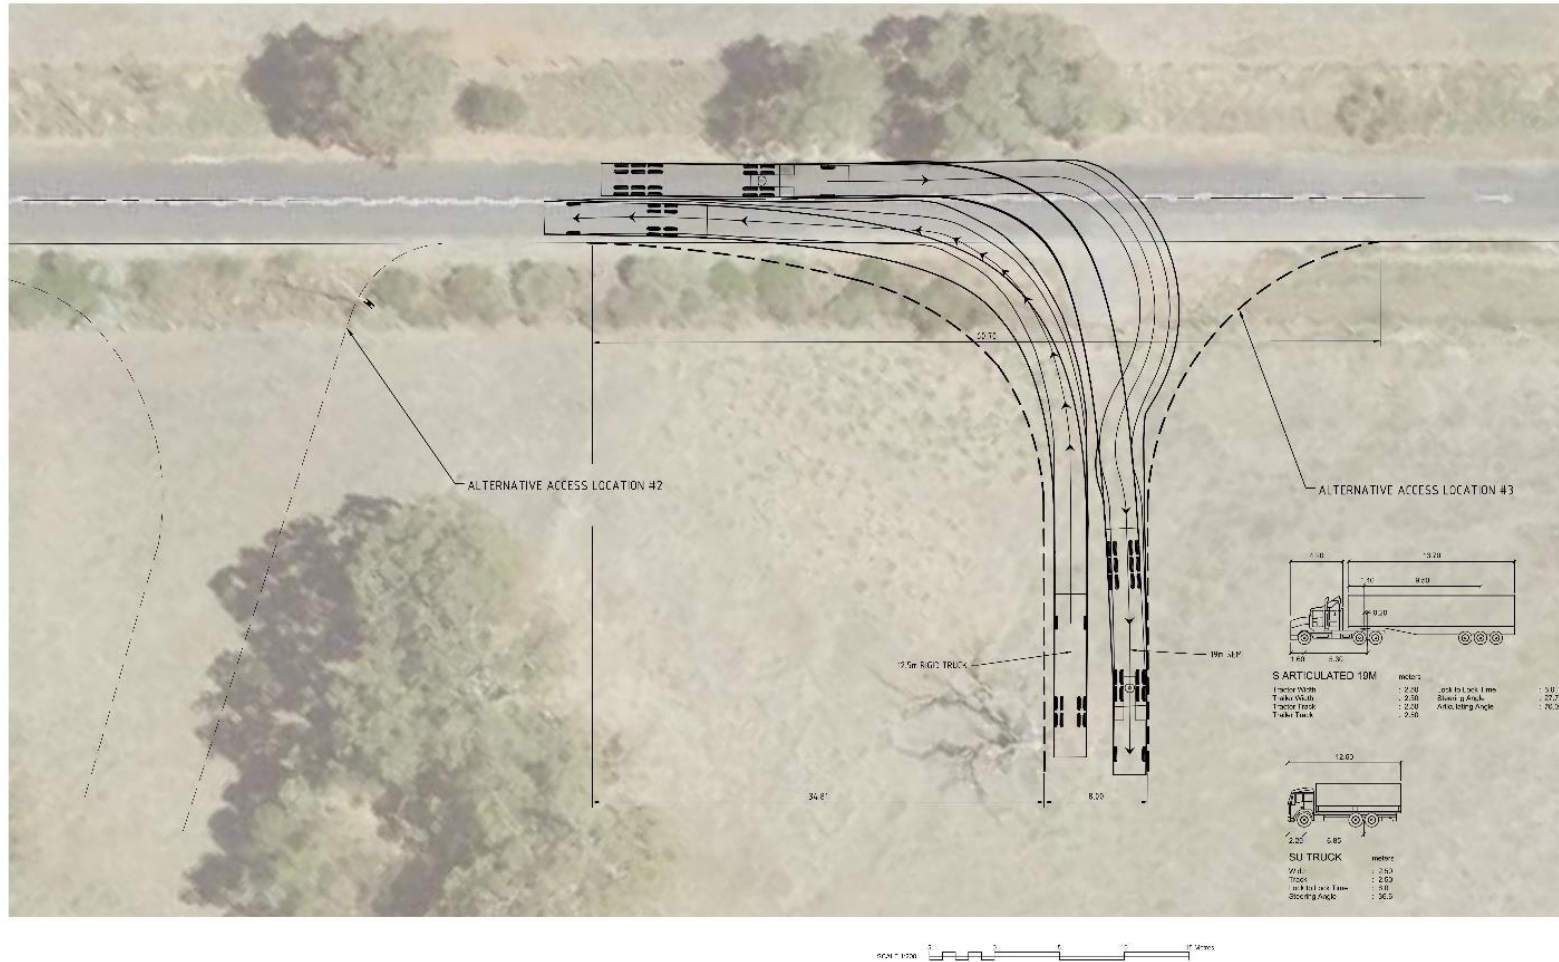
| BASIC RIGHT (BAR) TURN TREATMENT ON A TWO-LANE RURAL ROAD PROPOSED FOR THE SITE ACCESS ON PFEIFFER ROAD
